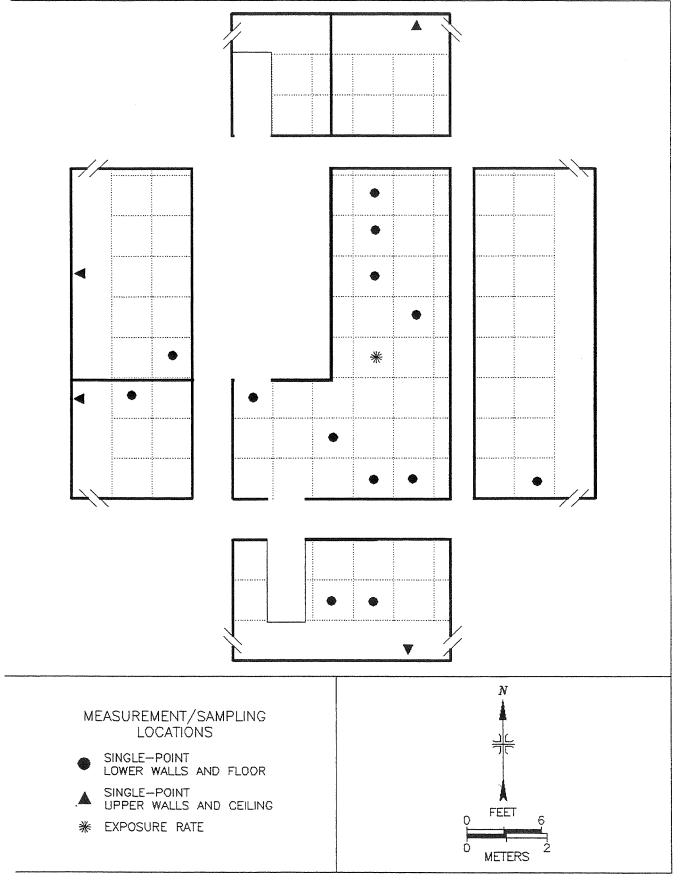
Building T012, Room 109 - Measurement and Sampling Locations
